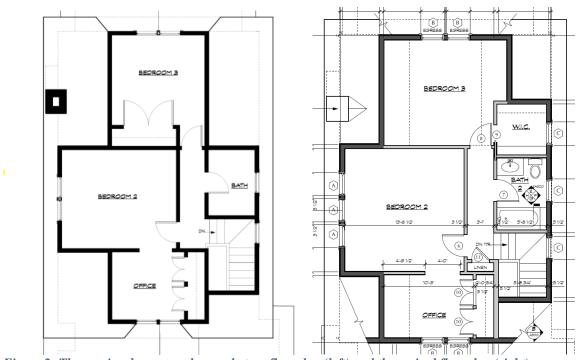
The previously approved second-story floorplan (left) and the revised floorplan (right).
